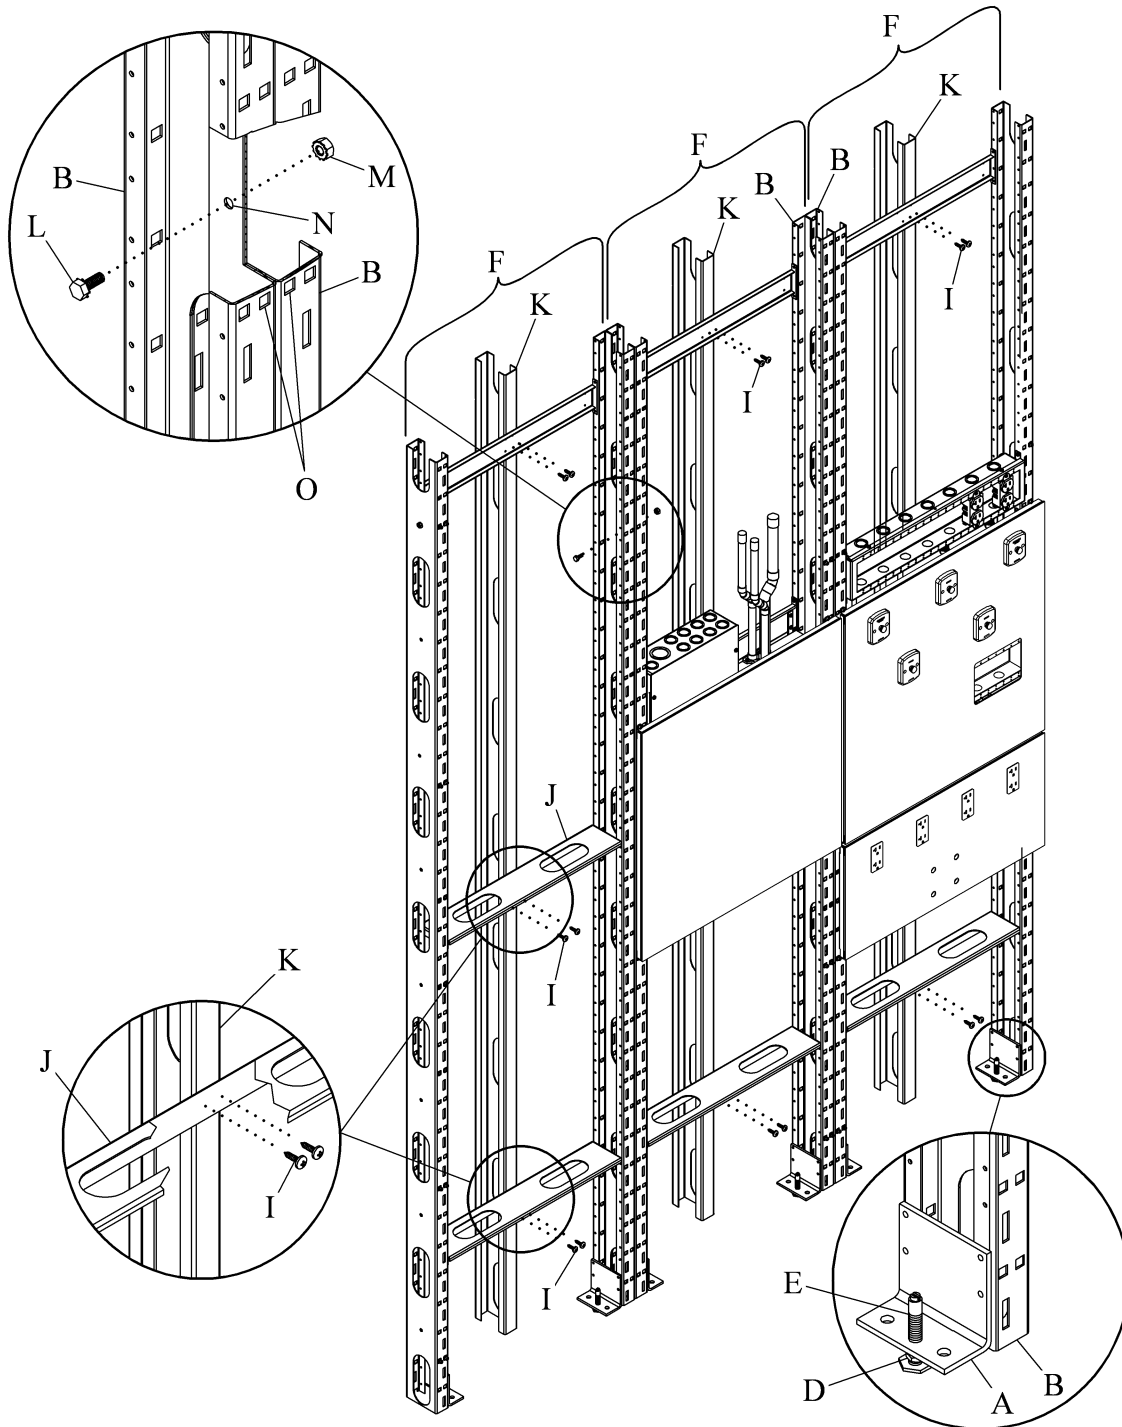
Elements™ Headwall System—Surface Mounted Installation
